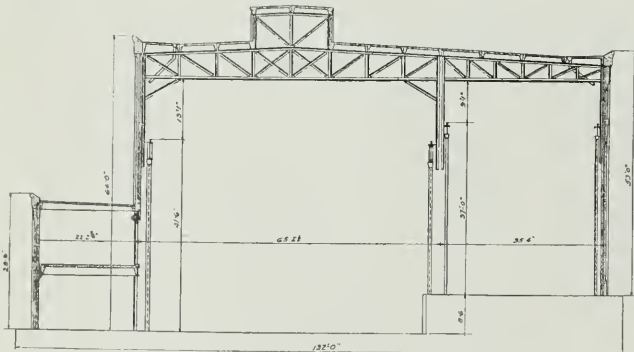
Section Through Power House, Cedars Rapids, Quebec.
